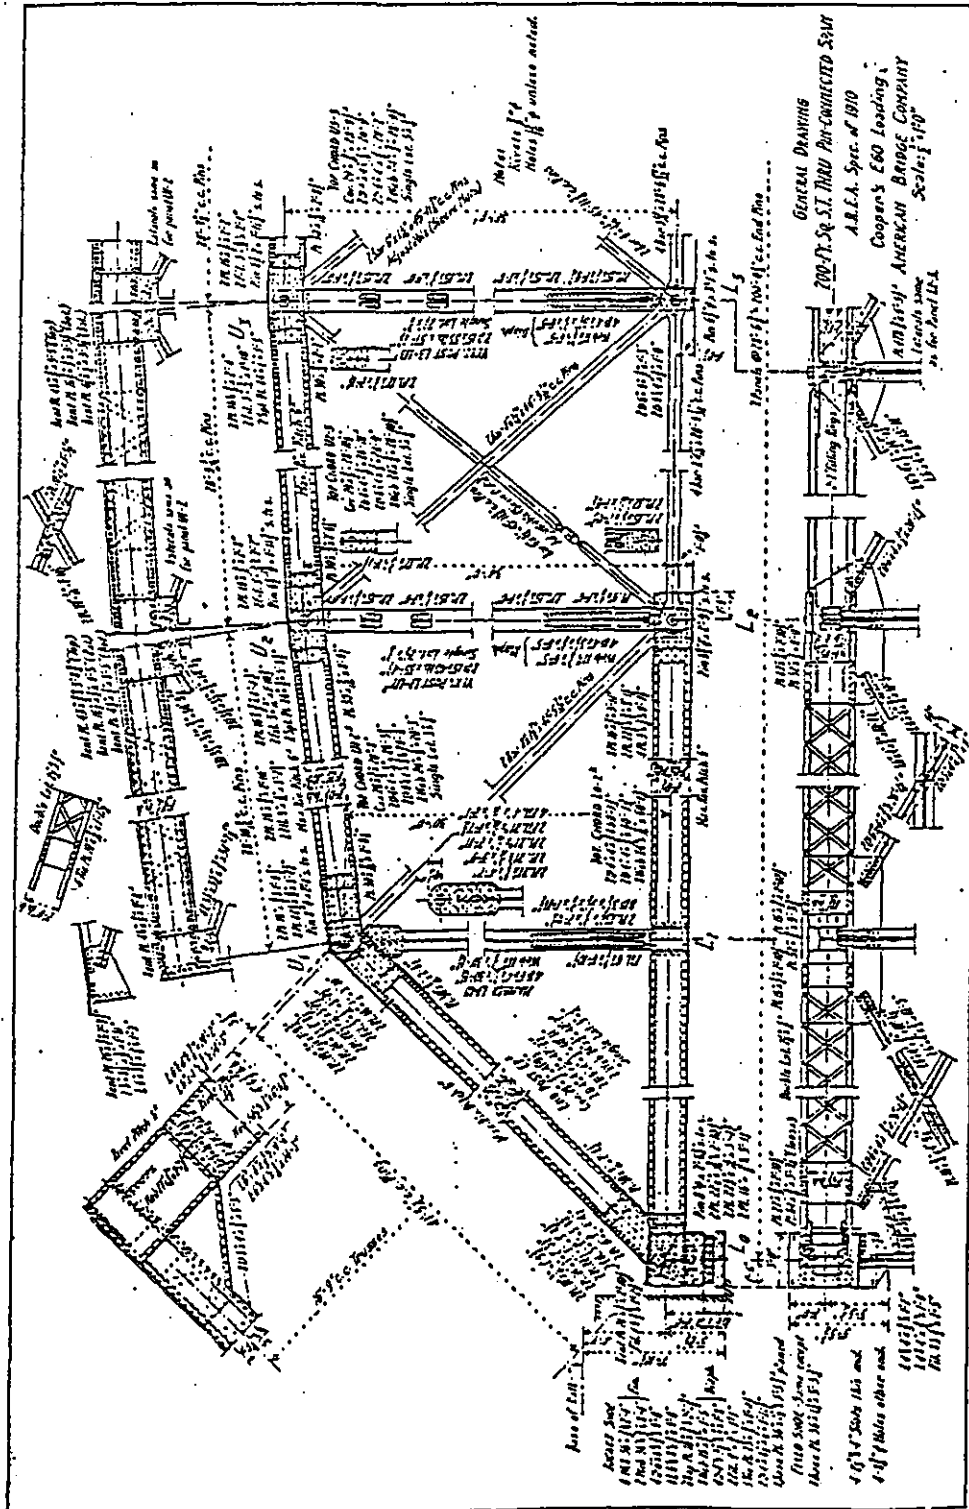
DESIGN FOR 200 FT. SPAN TRUSS RAILWAY BRIDGE.
